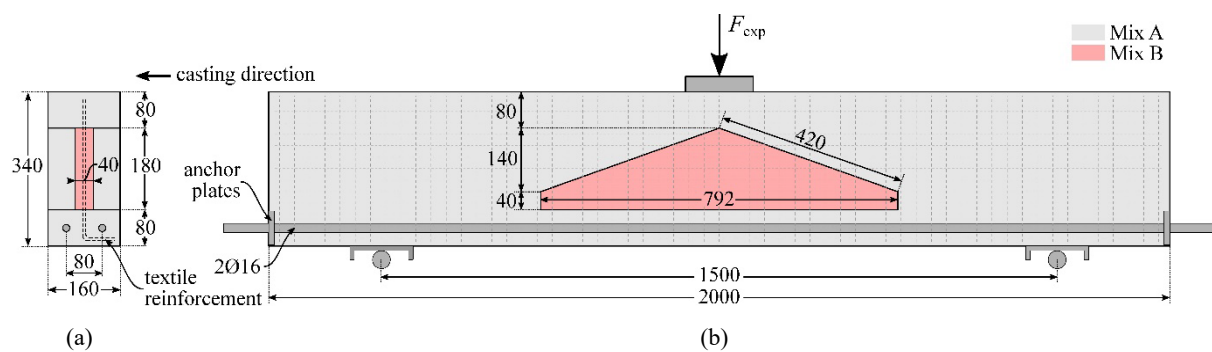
Layout of the functionally graded TRC-beams: (a) cross-section at midspan. The central part is narrowed to 40 mm in thickness. (b) Front view of the specimen. The high strength concrete is shown in grey while low strength concrete is shaded light red. [all dimensions in mm]
